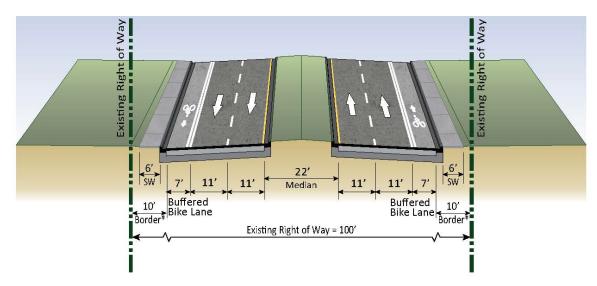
SR 29 Typical Section from North of Seminole Crossing Trail to CR 846
